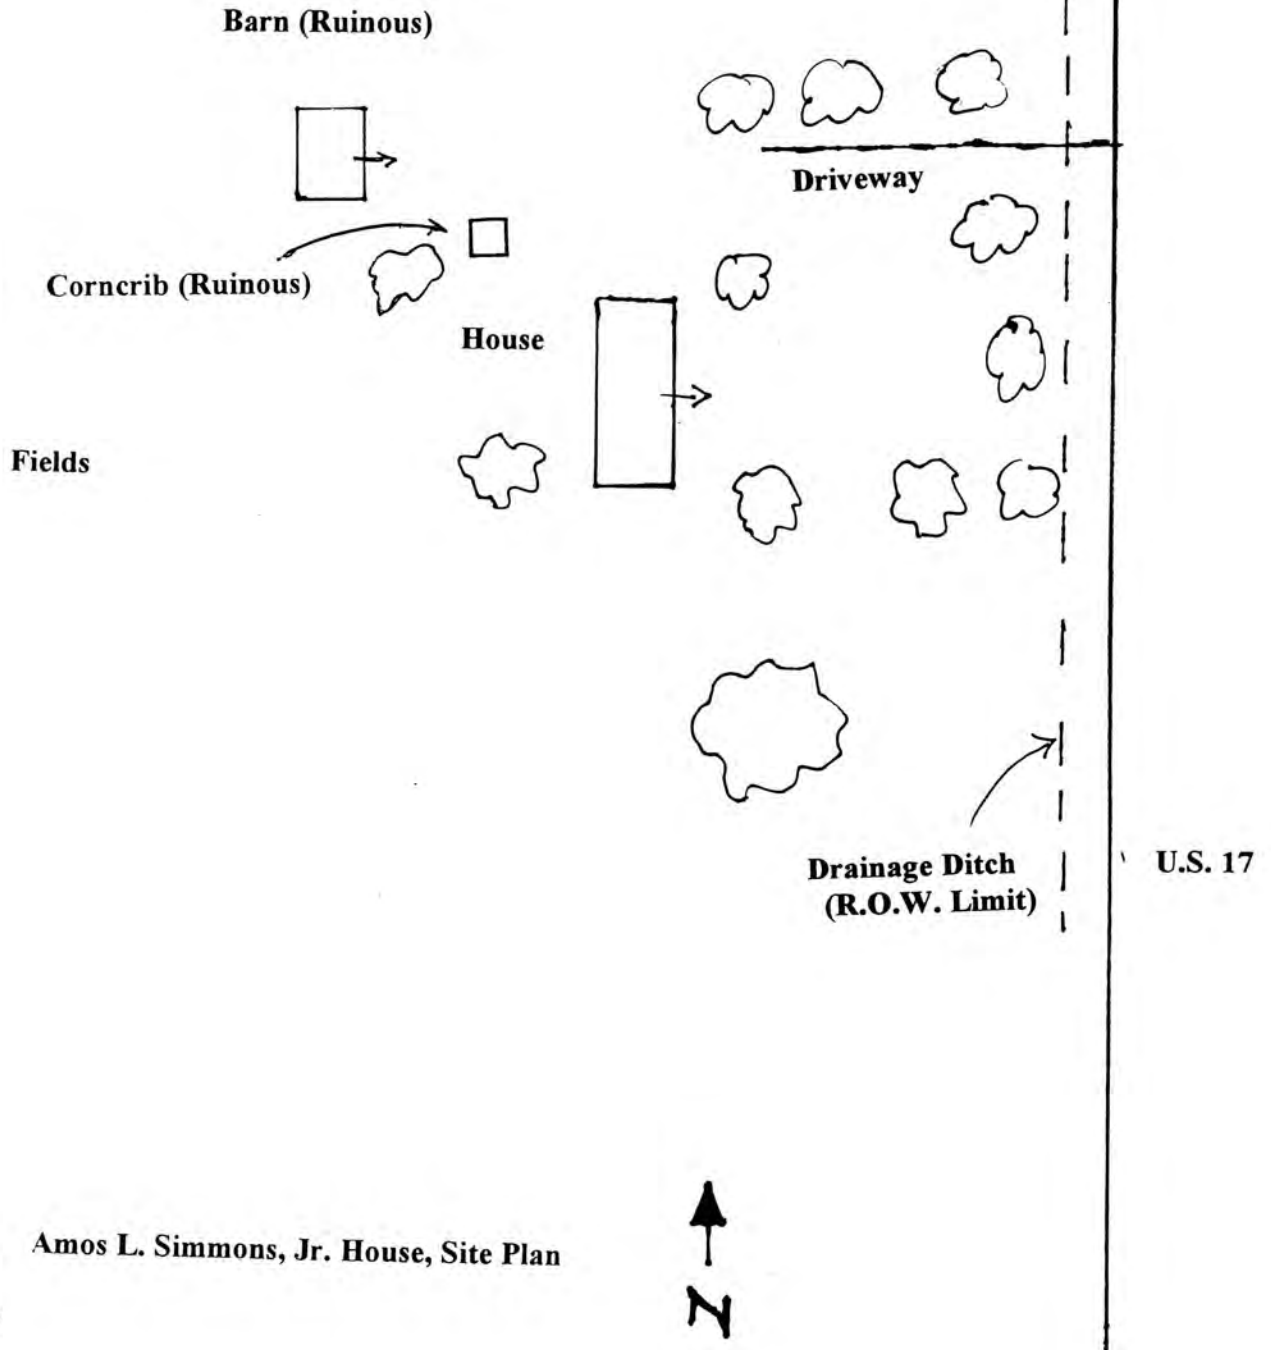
Amos L. Simmons, Jr. House, Site Plan
